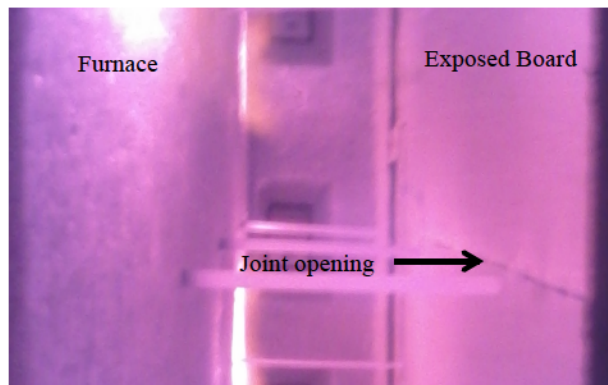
Joint opening on exposed side of a CFS wall during test
